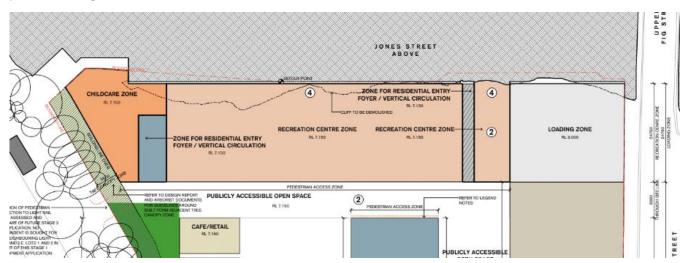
Extract of Concept Envelope Plan, showing childcare and recreational centre zones (Source: Tzannes)
